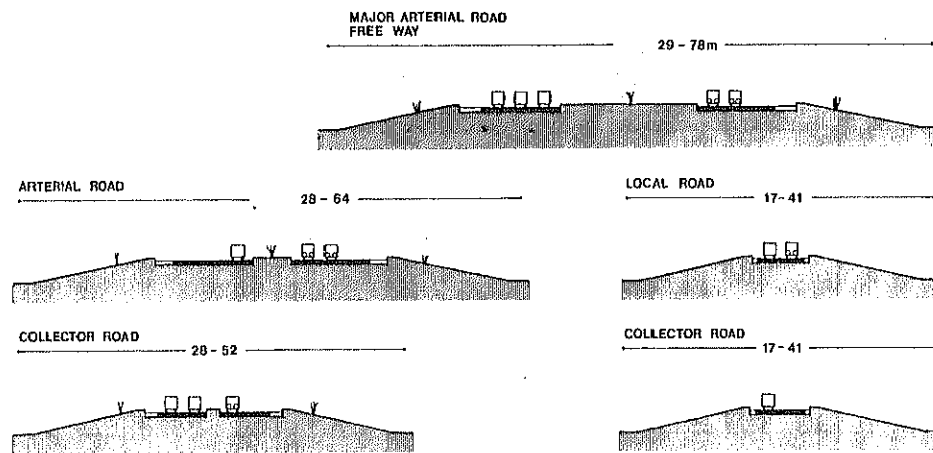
TYPICAL CROSS SECTION OF PRIMARY SYSTEM
